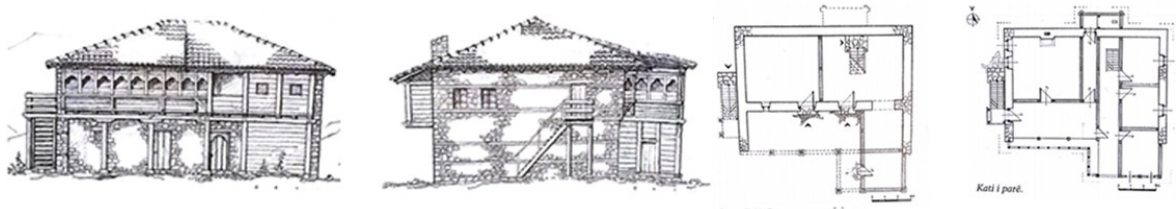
Dwelling with wooden porch (Drançolli, 2001)
